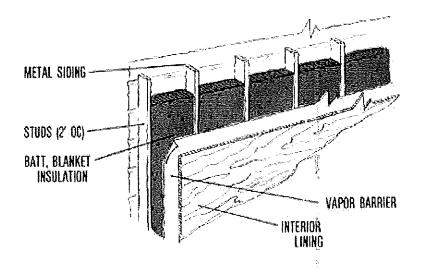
Stud wall insulation (R=13-15 if 2x4 studs, 20+ if 2x6 studs). Stud wall insulation is most common in heated farm buildings particular if walls are 8 feet or less in height.
